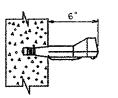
DETAIL OF INVERT FOR INLET WITHOUT CONTINUOUS PIPE
